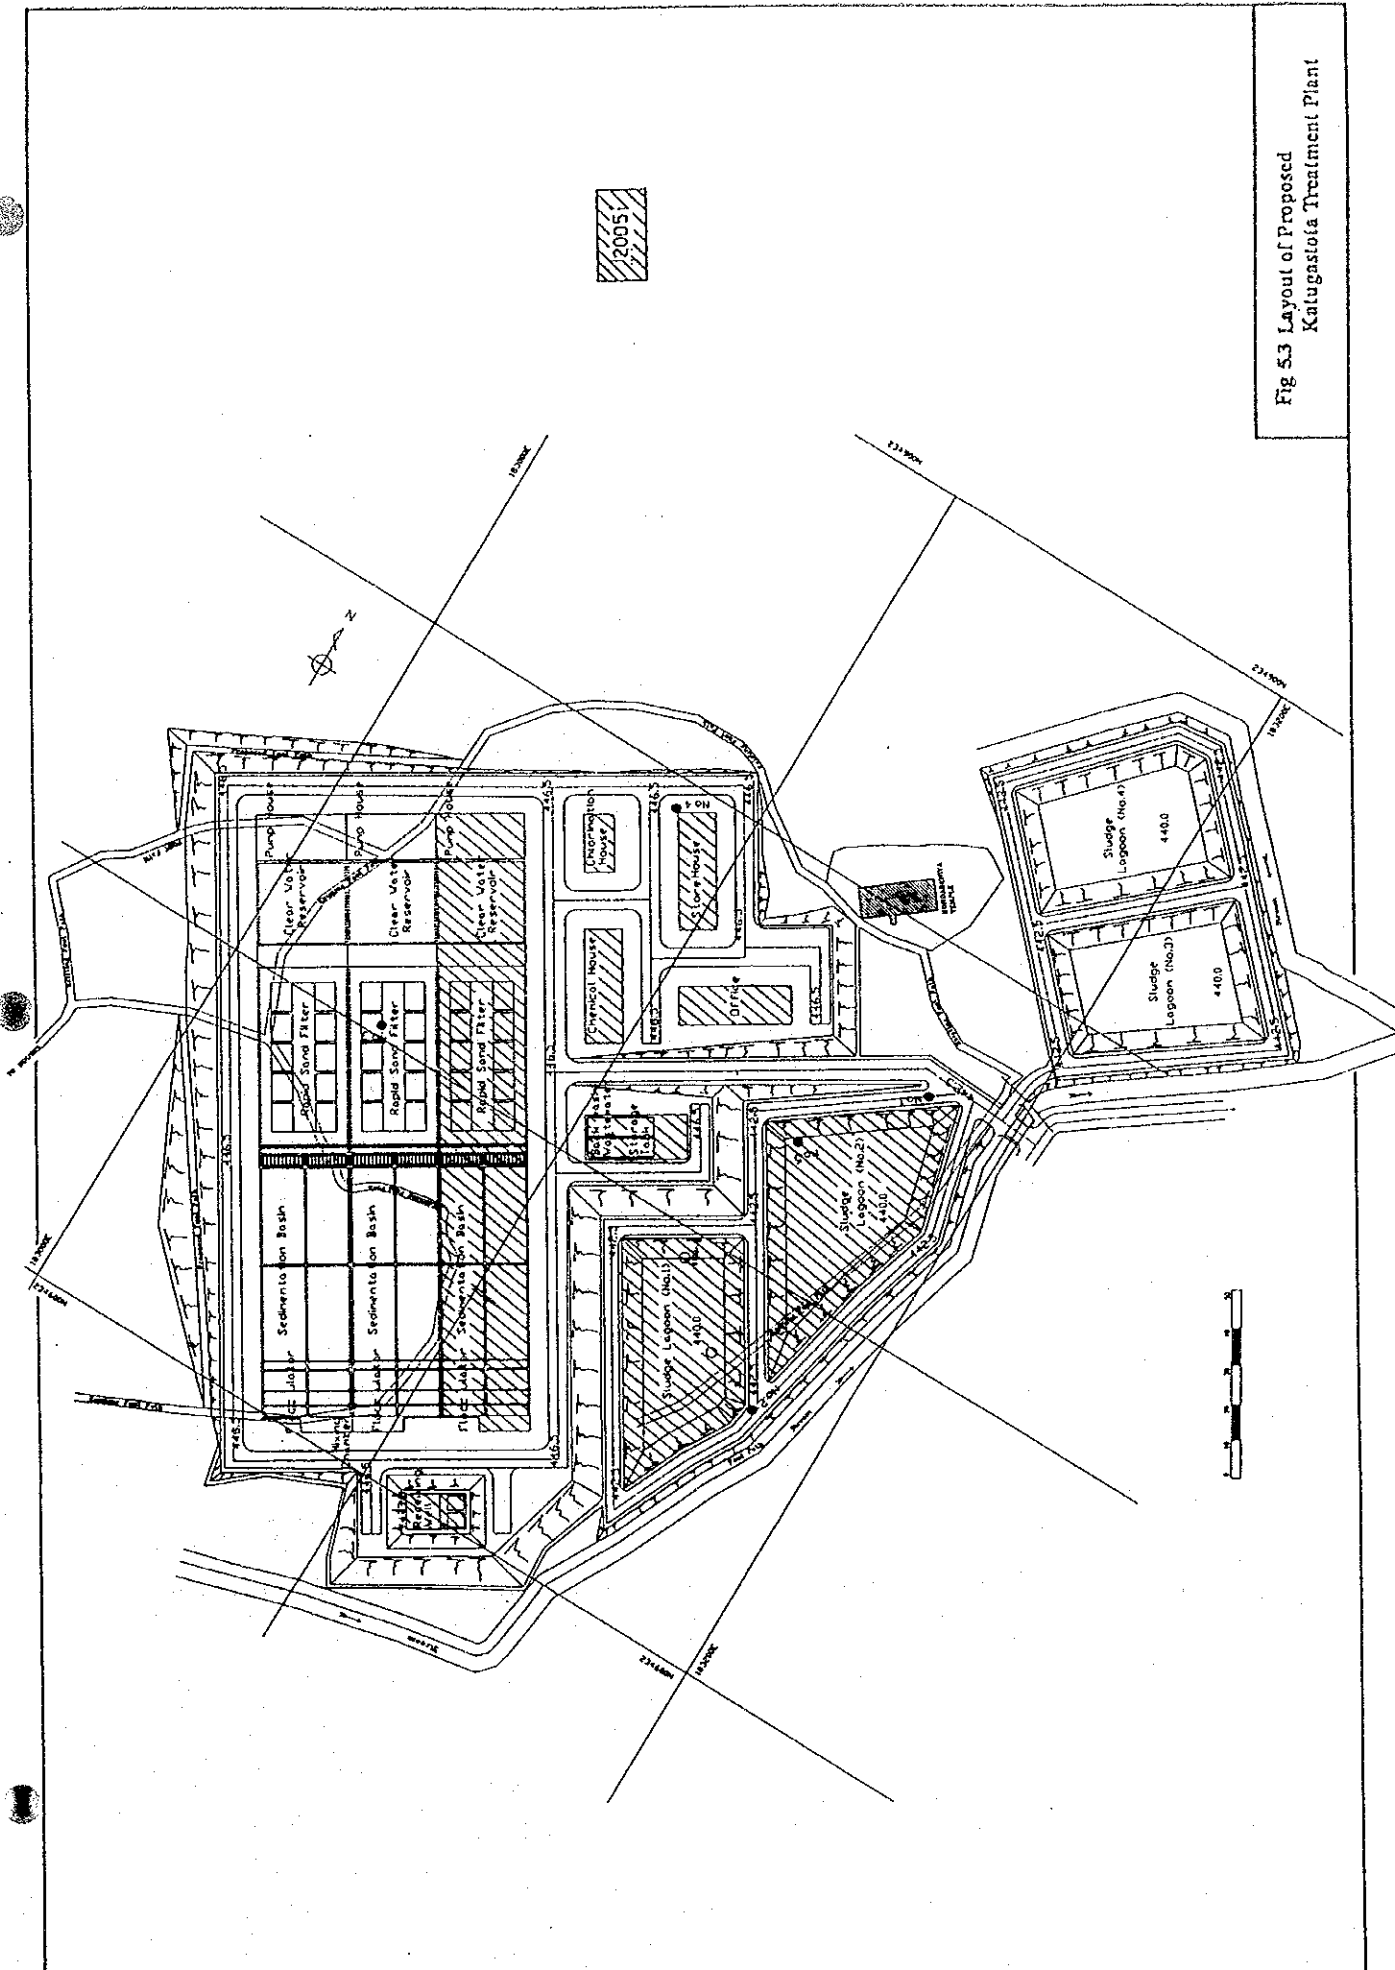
Layout of Proposed Katugastota Treatment Plant
